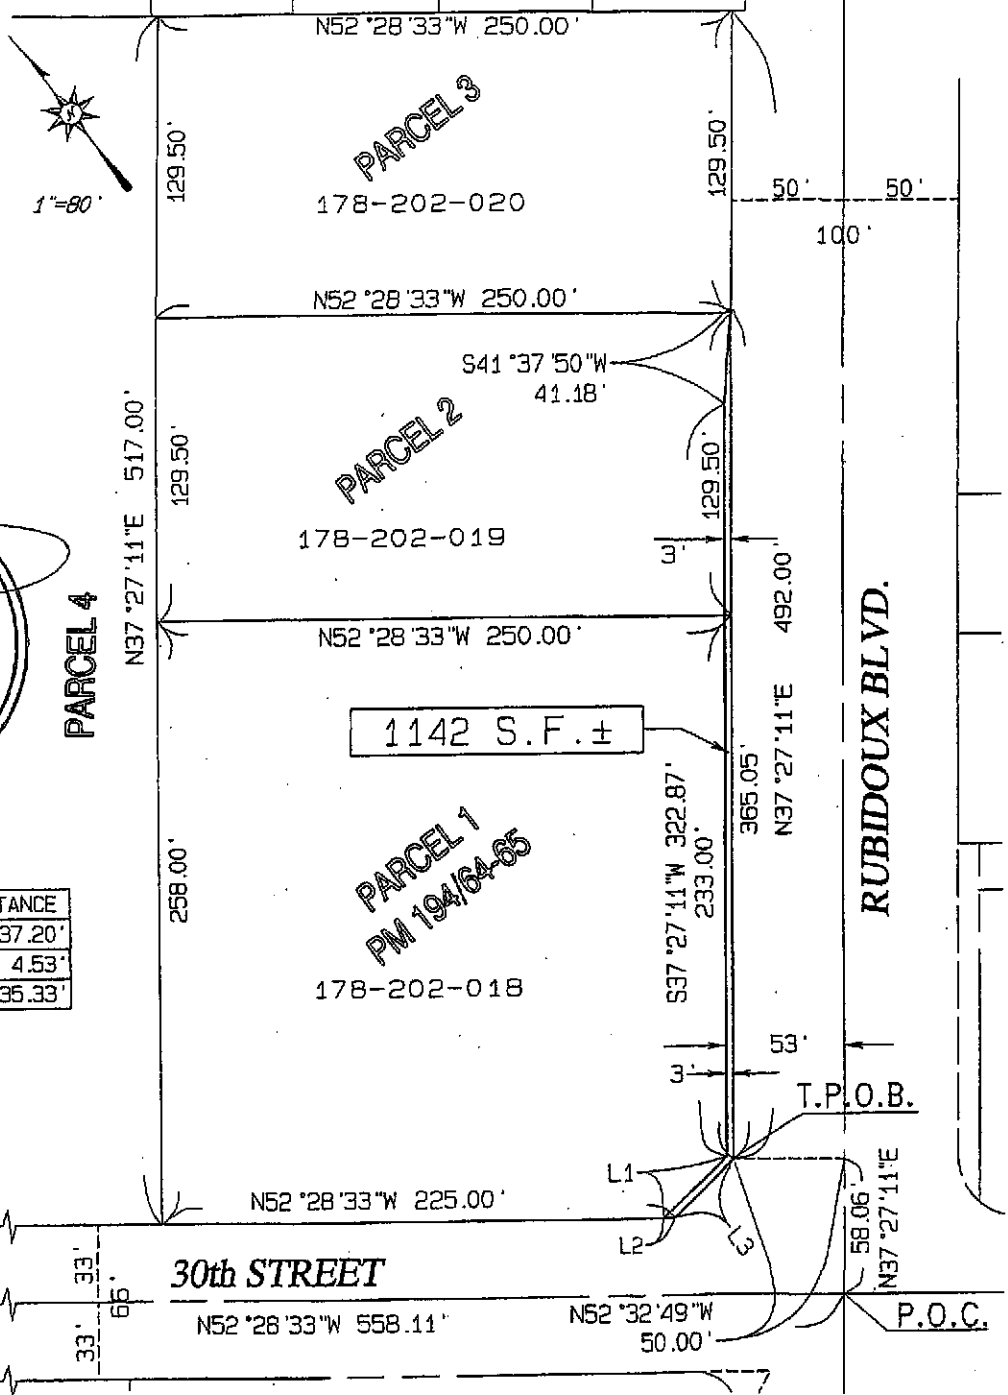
PUBLIC ROAD & UTILITY EASEMENT
